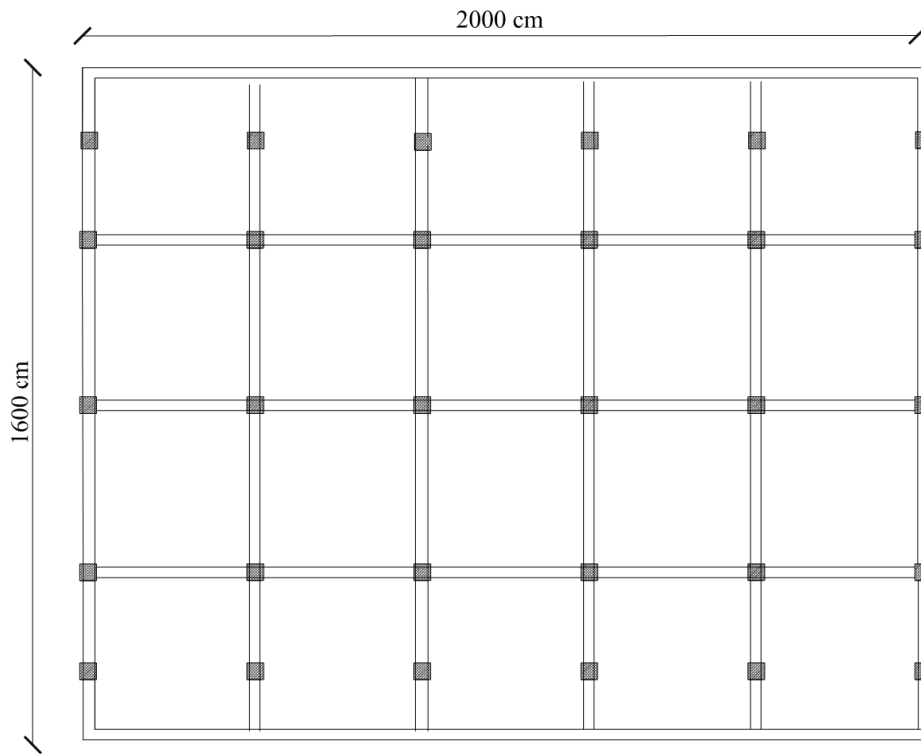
Floor plan of structure C ($T=0.58$ sec, $GDF=0.4$)
